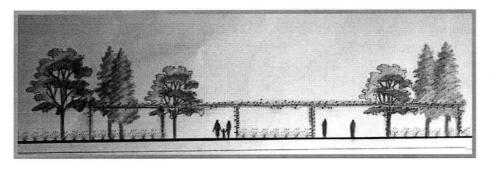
Portion of section/elevation H-H1 showing front entry into Rivers Plaza
